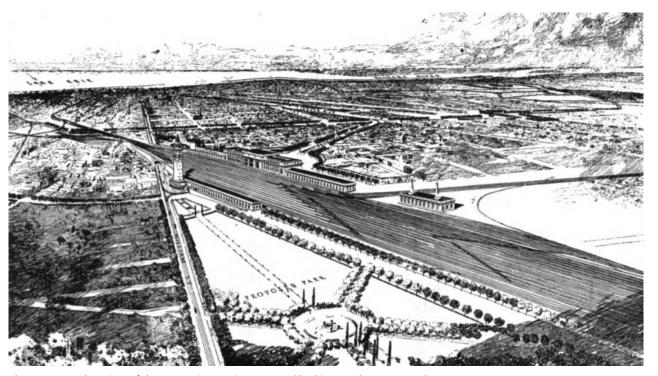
Another view of the 1907 union station proposal looking northwest toward Lake Erie. (Image from "Proposed New Union Passenger Station at Buffalo," *The Railroad Gazette*, 1907)
